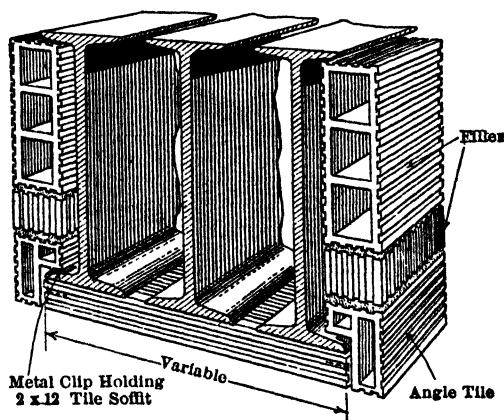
Angle and Soffit Method of Protecting Triple Girders, Showing Use of Metal Clips to Retain Soffit
